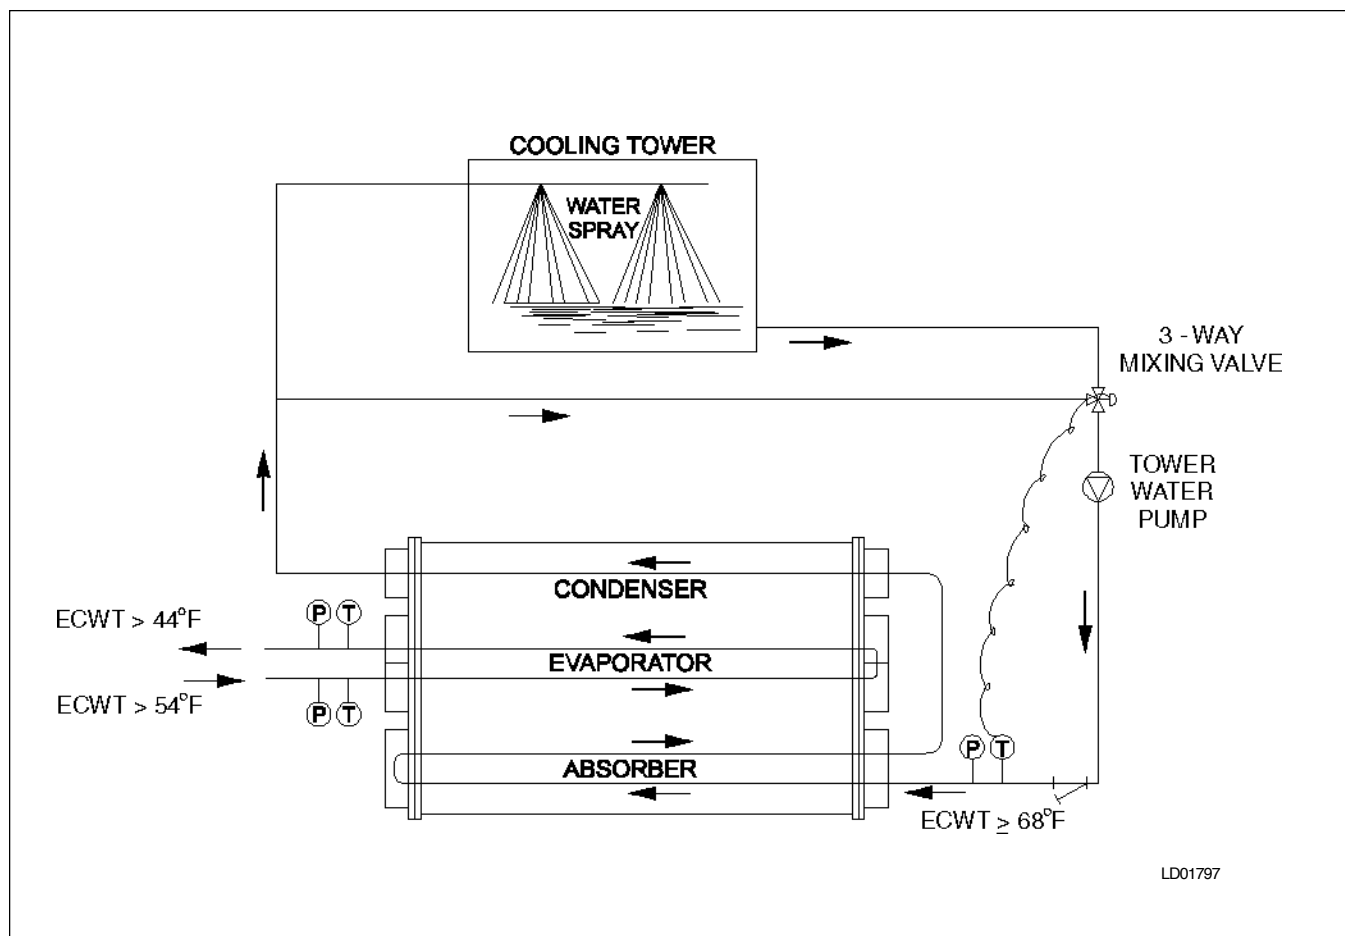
TOWER BYPASS PIPING SCHEMATIC
